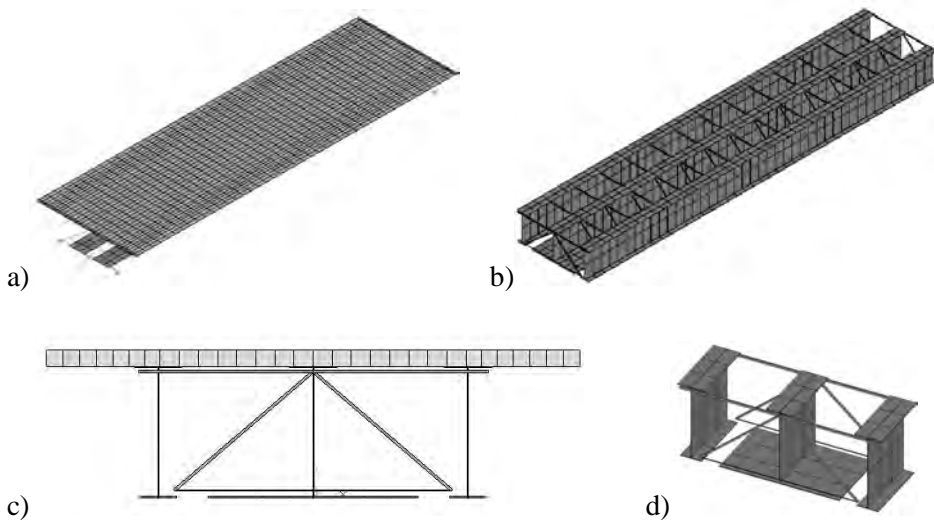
Multi-Beam Model of Sesia viaduct: general view (a), steel girders elements (b), model cross-section (c), steel elements detailed view (d).
